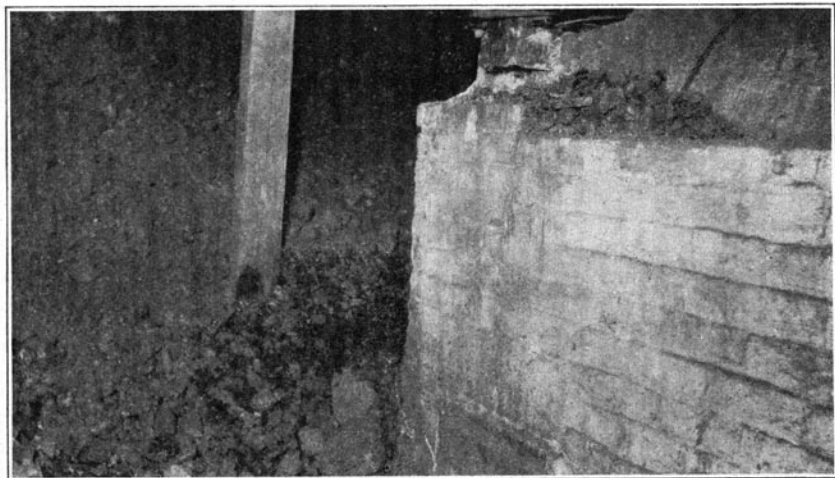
COAL PILED IN CONTACT WITH BRICK WALL OF FURNACE
